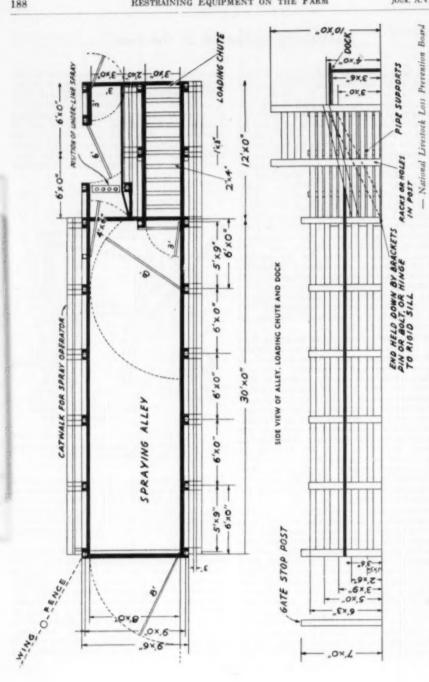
Utility livestock alley with sorting alley and loading chute. Underline spraying equipment unit may be placed in a partially opened gate at the end of alley. Place temporary post to gate opening will be 30 in. wide.
